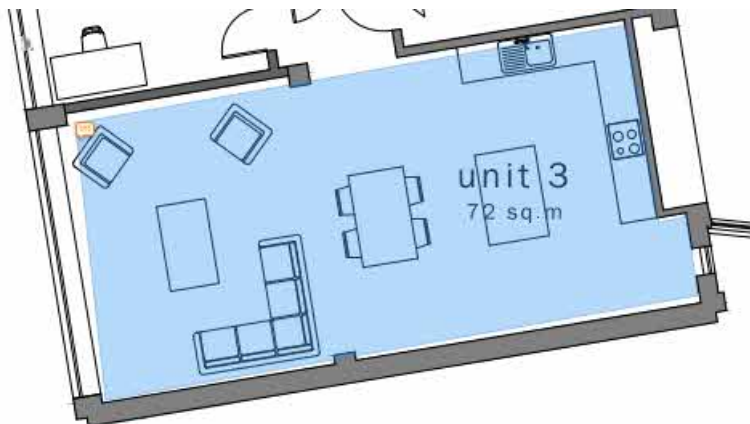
Unit 3 living kitchen dining room - Extract from floor plan – drawing number 1600529.2. drawn by AC at Marrons
